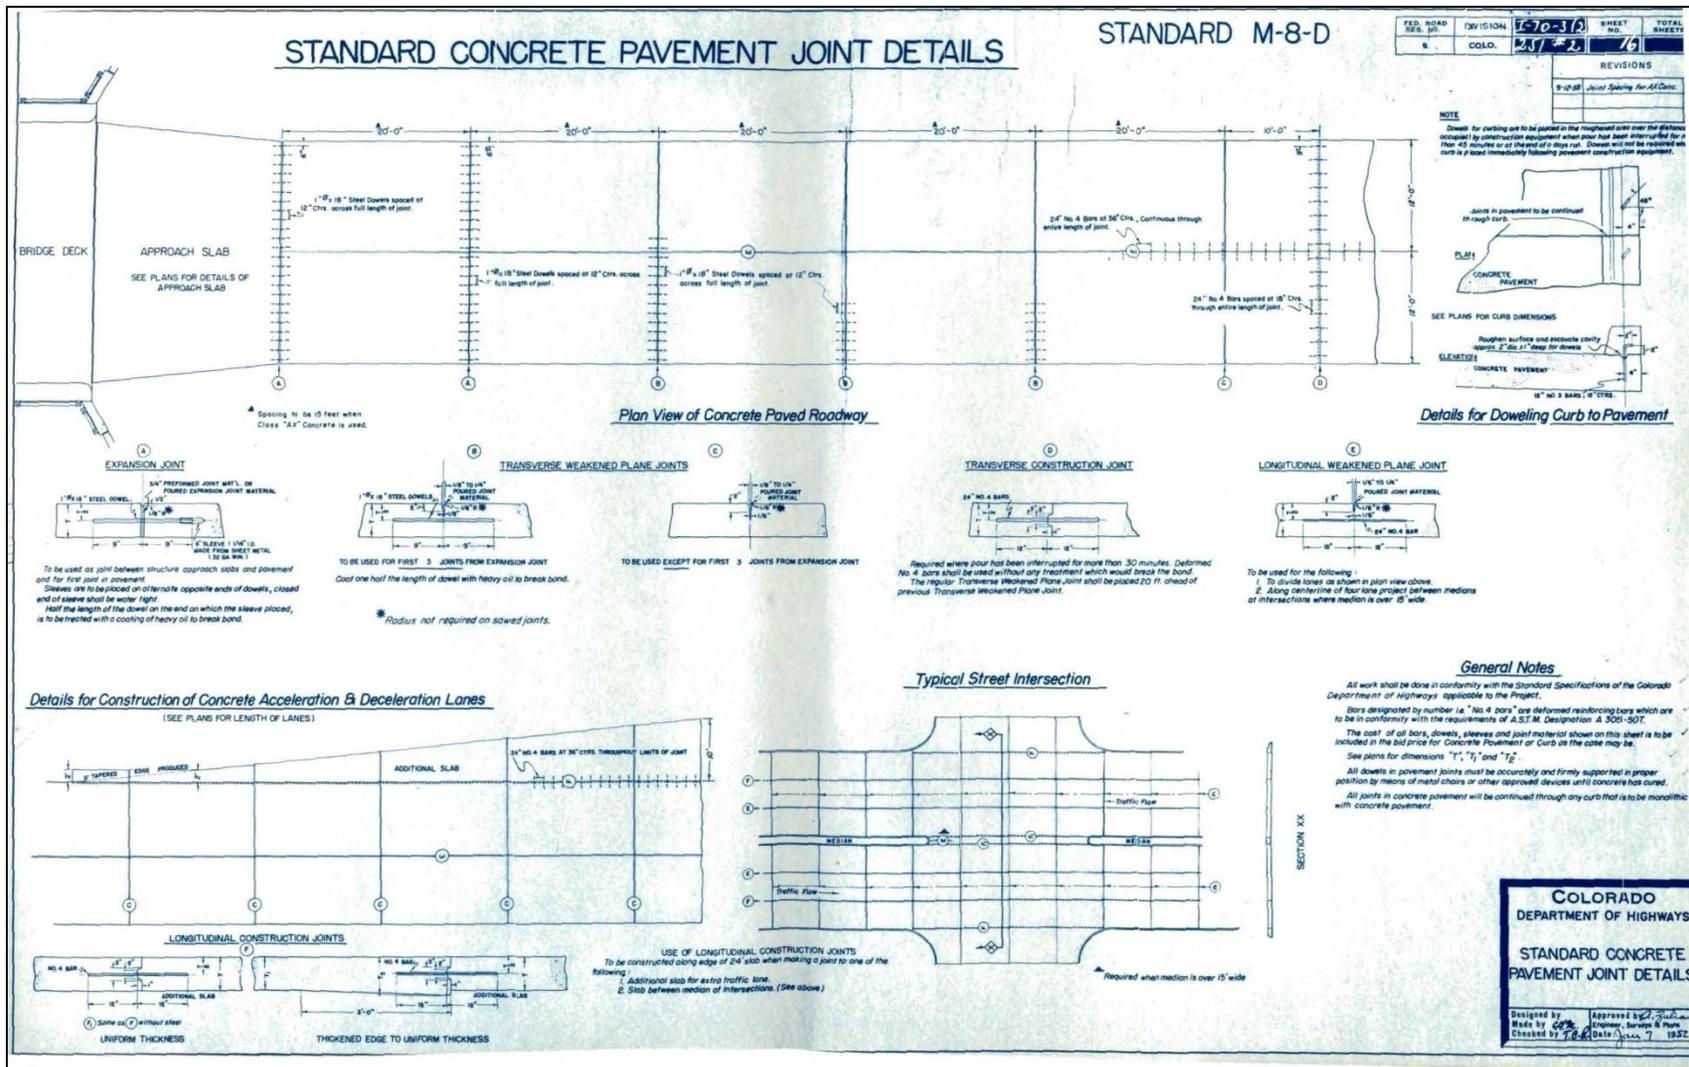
Twin Tunnels As Built Plans (Sheet 16). Details of concrete pavement joints.
